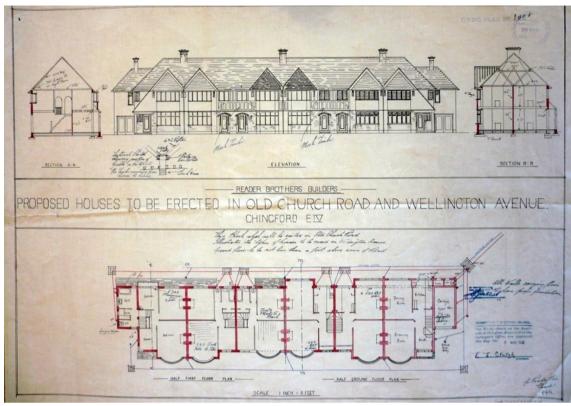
Drawings for houses in Old Church Road and Wellington Avenue. The drawings also include sizes of floor joists, foundations and drainage for approval by the district surveyor (Reader Brothers Collection, LMA/4430/05/022, London Metropolitan Archives).
